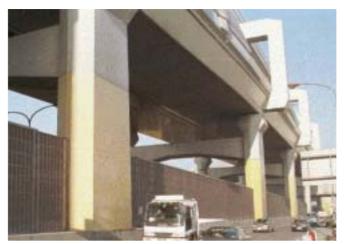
RC bridge piers retrofitted by AFRP sheets.
